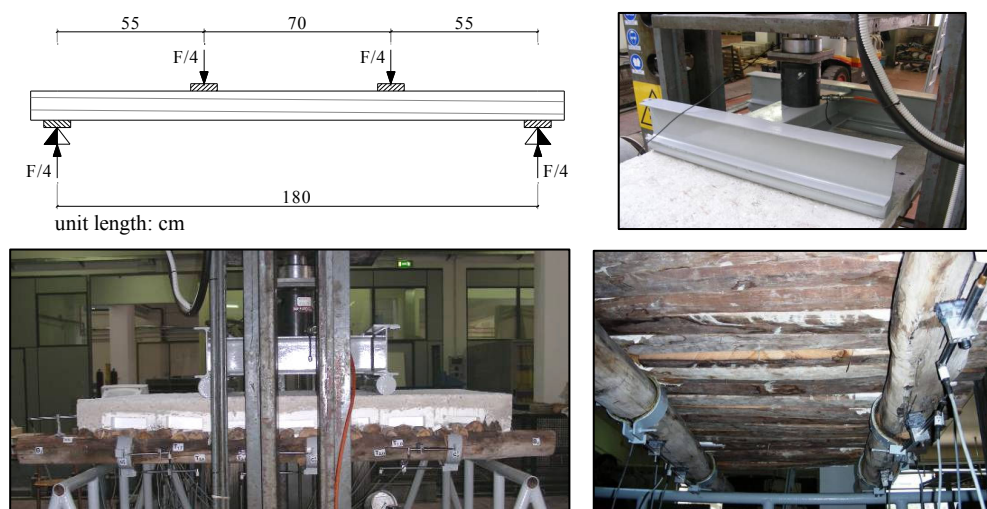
Bending test on composite floor: testing apparatus and set-up.
